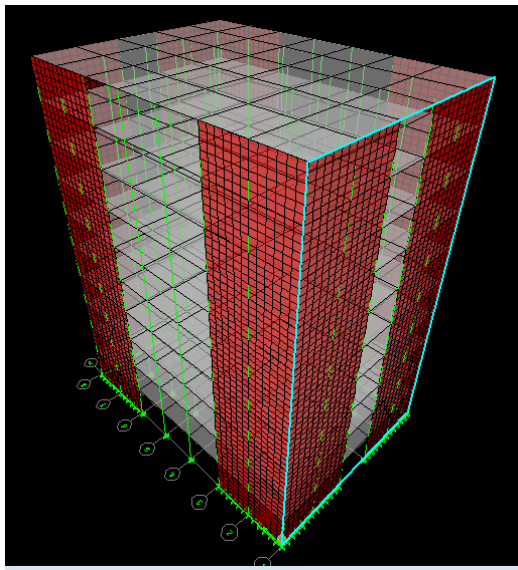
3-Dimensional View of 10 storied structure with L shape shear wall
